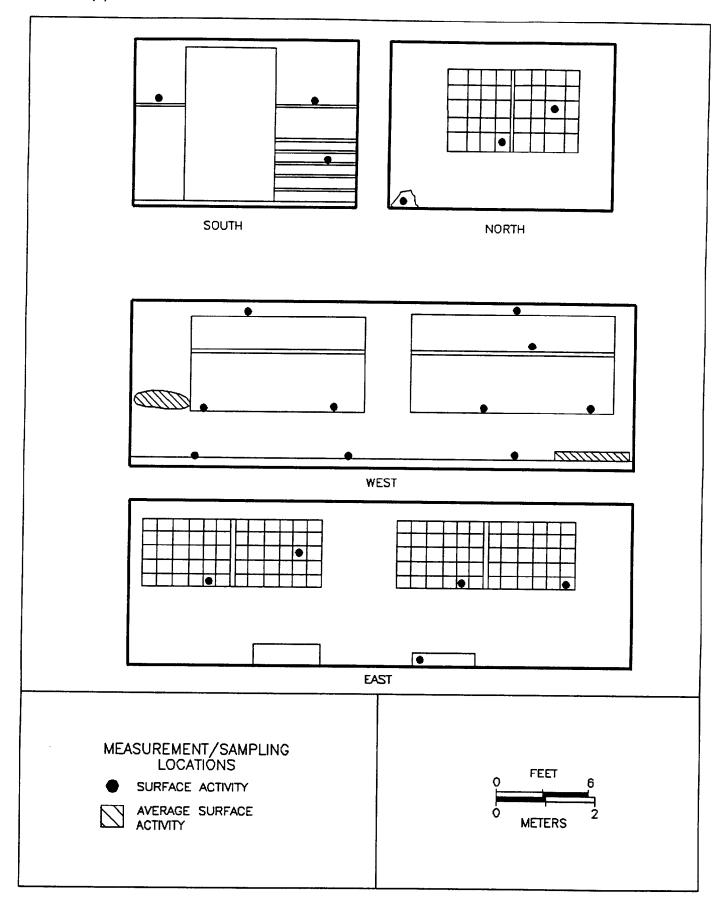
Building 8, Tool Room Walls - Measurement and Sampling Locations
